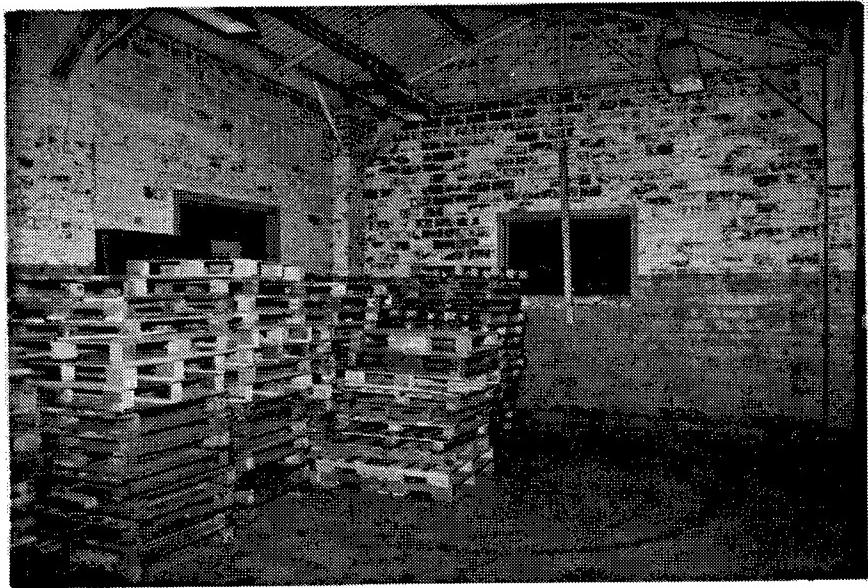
Building CA-16: Interior view of this Primer Service Building.
